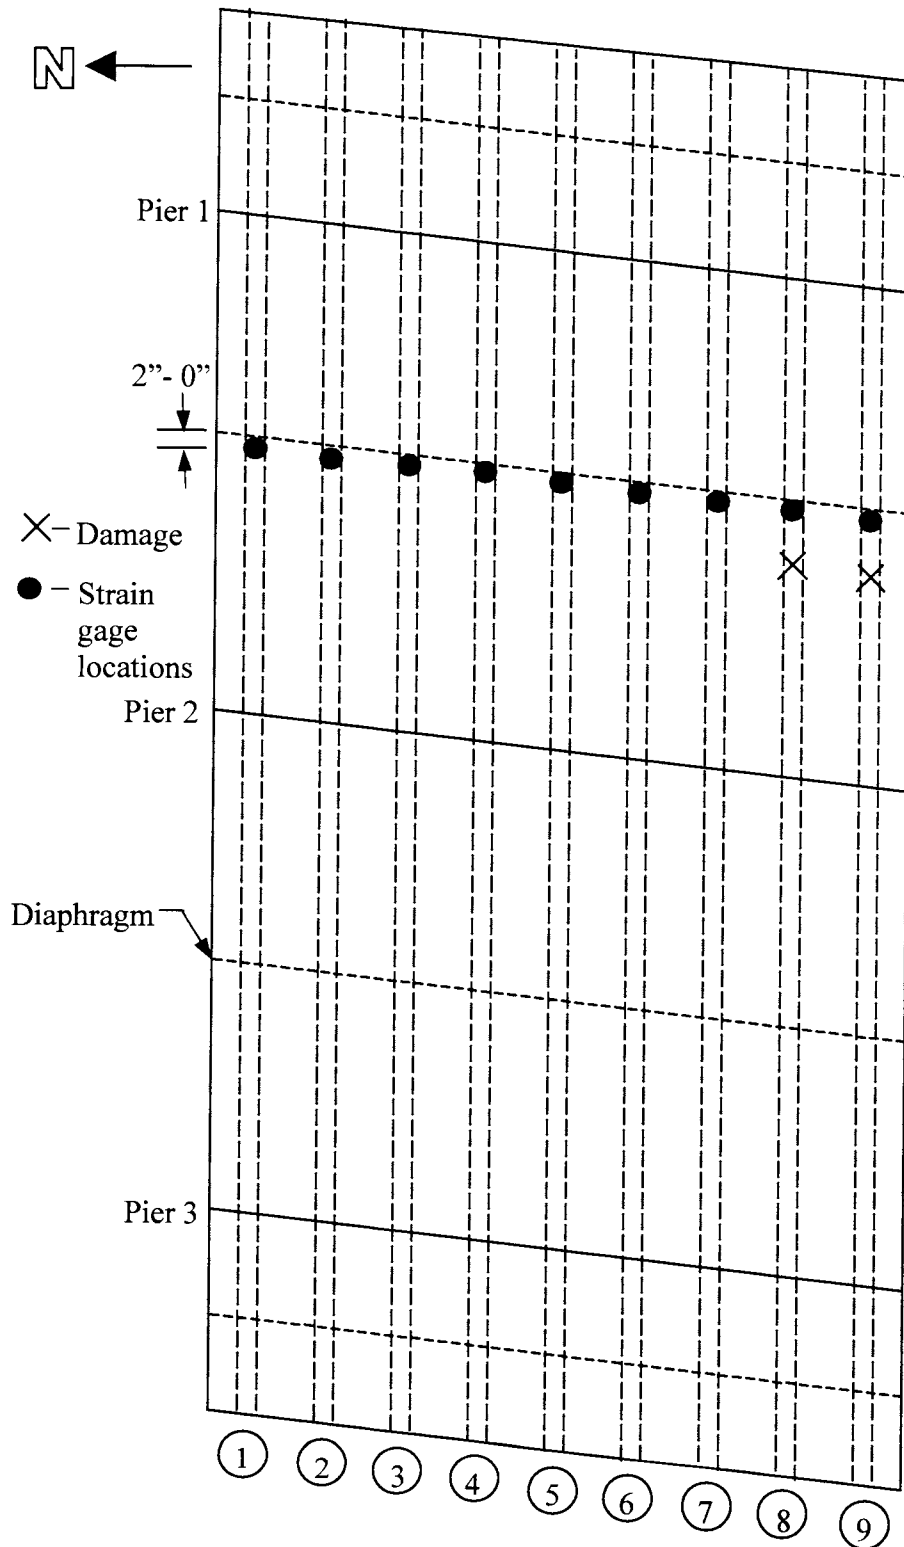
Strain gage schematic for the De Soto Bridge.
